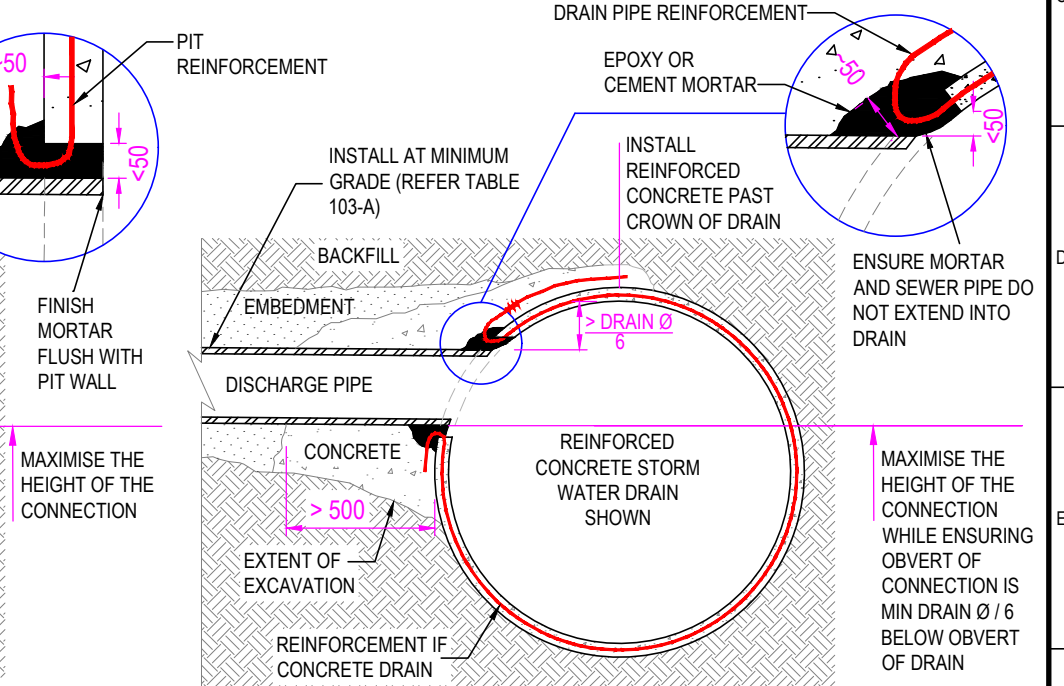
H: SEWER OVERFLOW TO STORM WATER DRAIN CONNECTION
